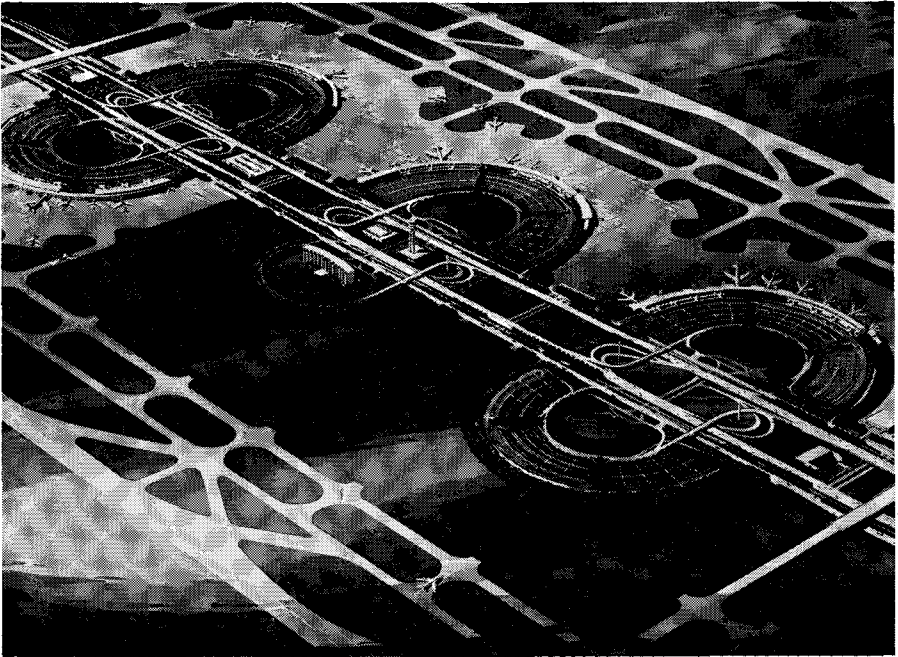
Artist's rendering of Phase 1 project showing four terminals, runways, and roadways. Control tower is at center.
